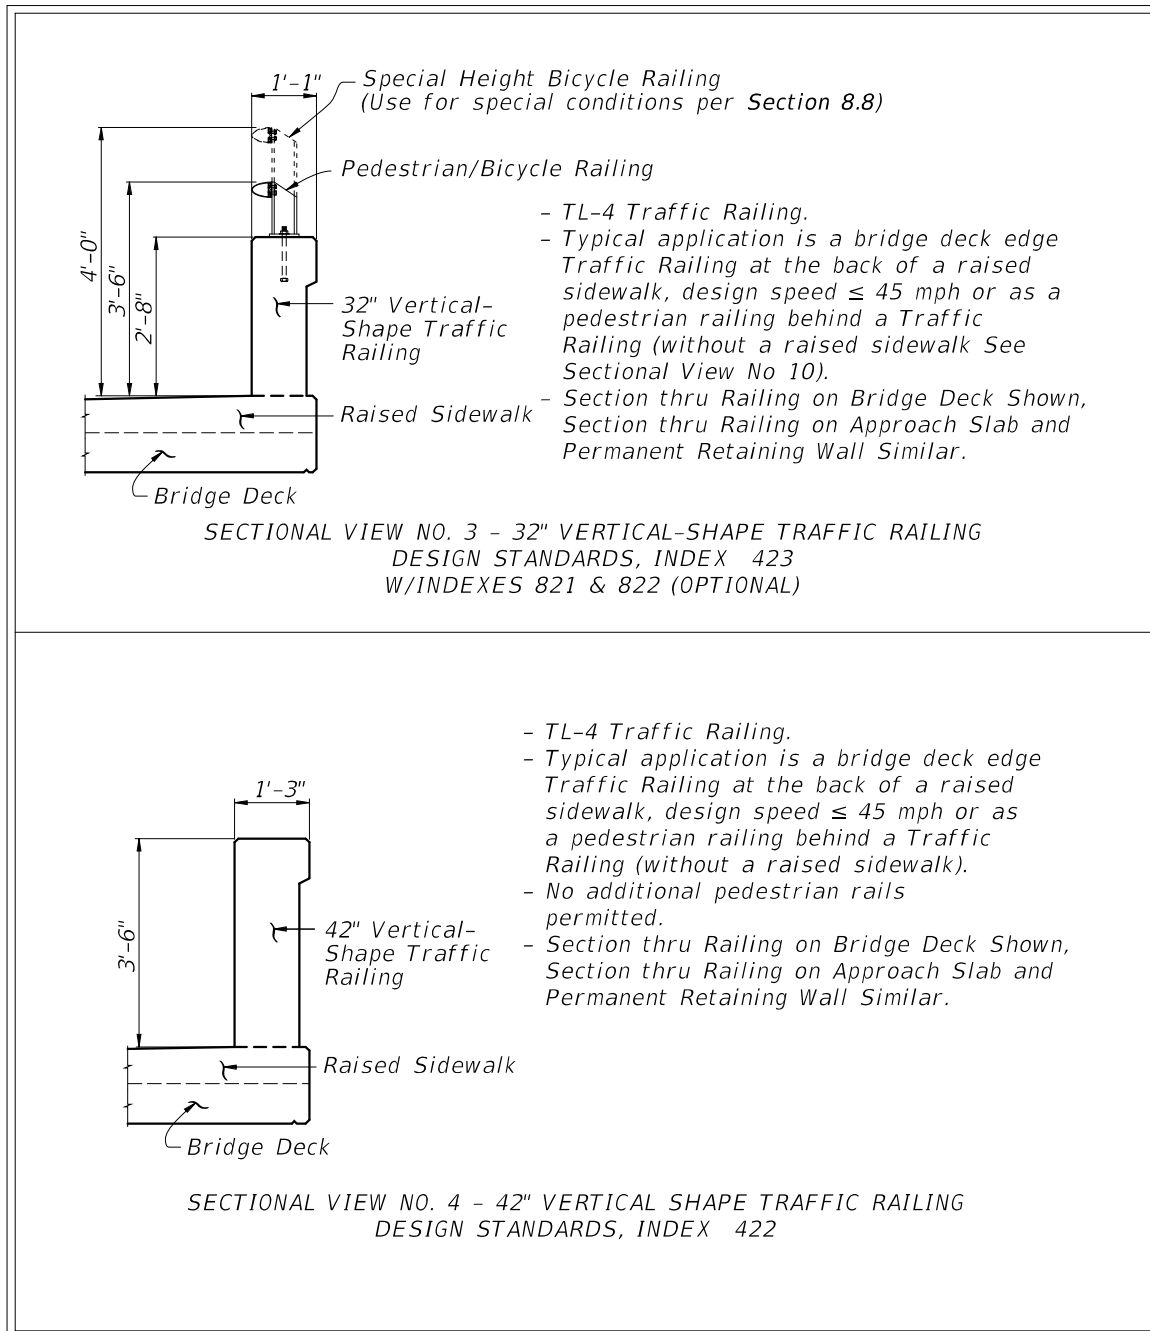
Bridge Traffic Railings – Other Shapes
